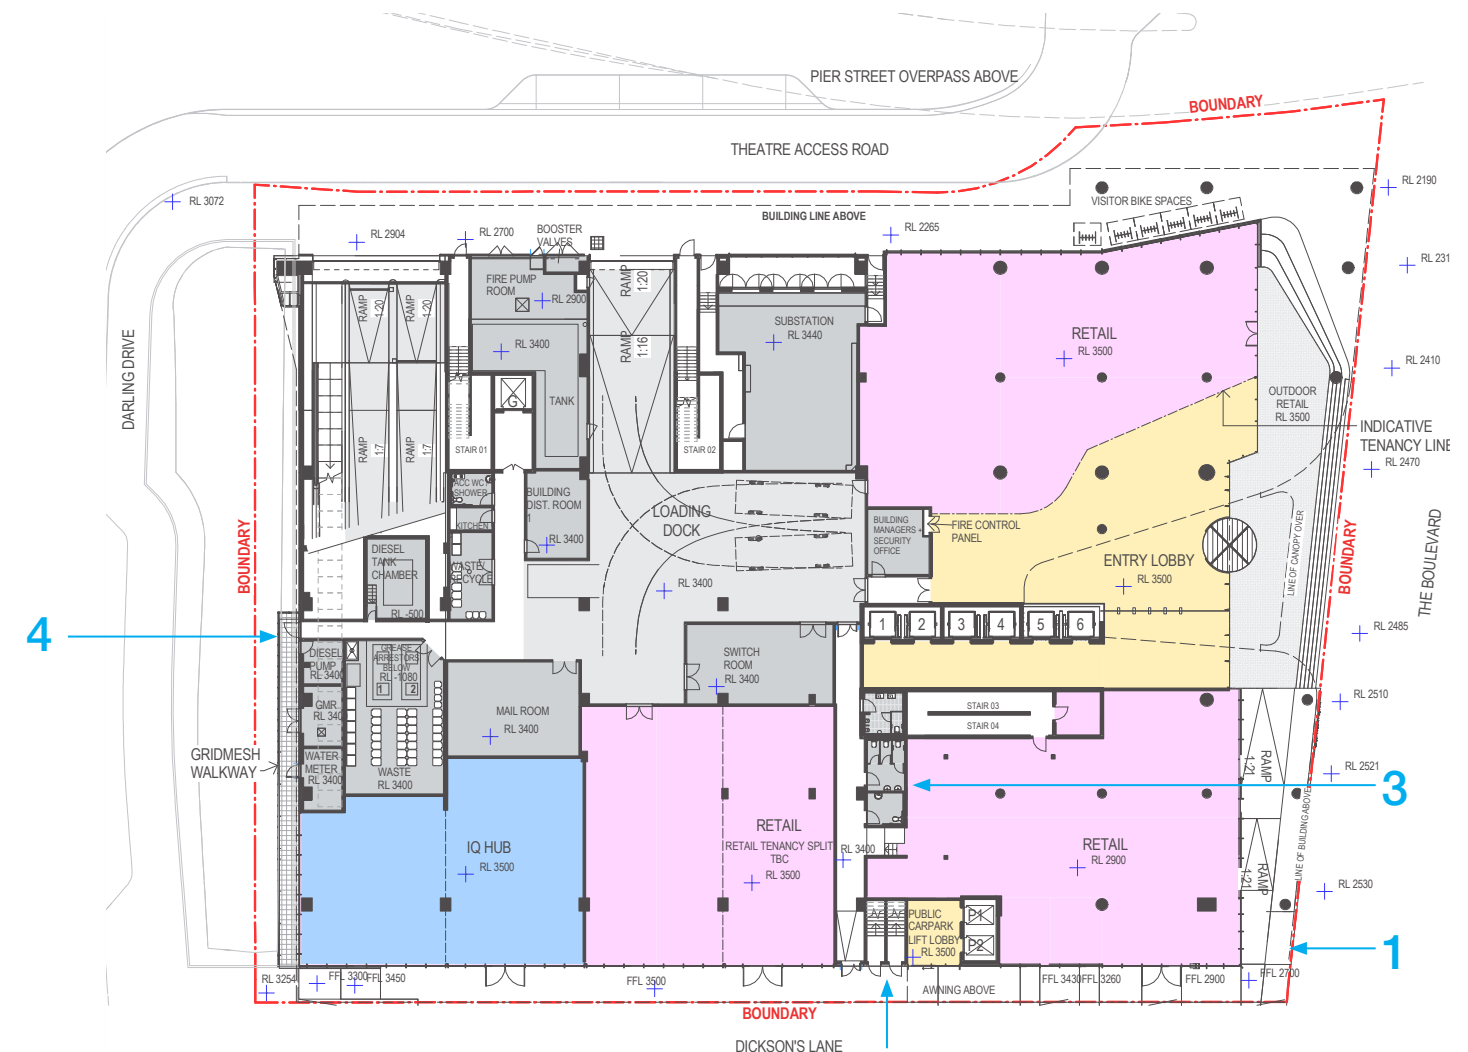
Section 96 NW Plot ground plan design proposal
